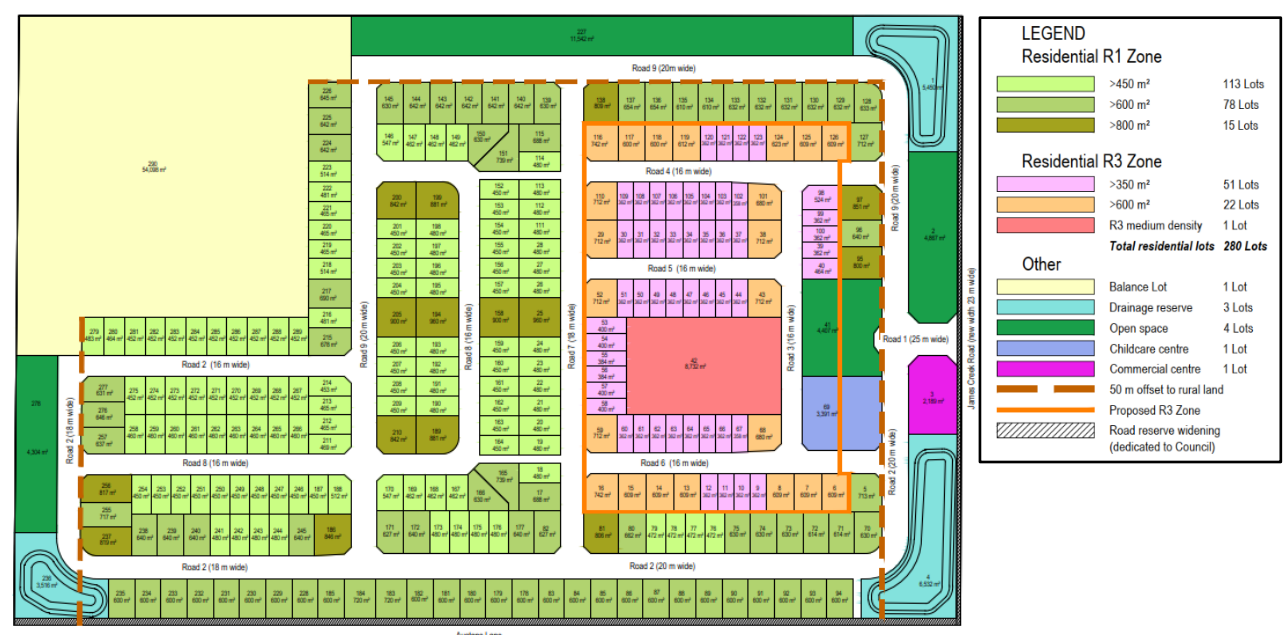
Proposed Subdivision Plan (as originally lodged) (Source: Geolink)
